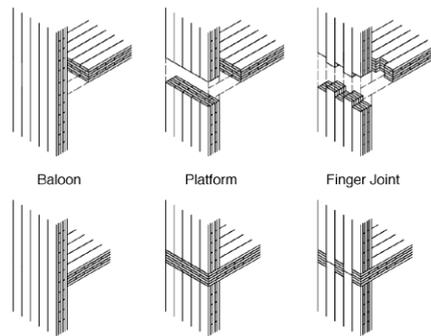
Connection of CLT Construction wall-slab elements: baloon (left); platform (middle); finger-joint (right).
